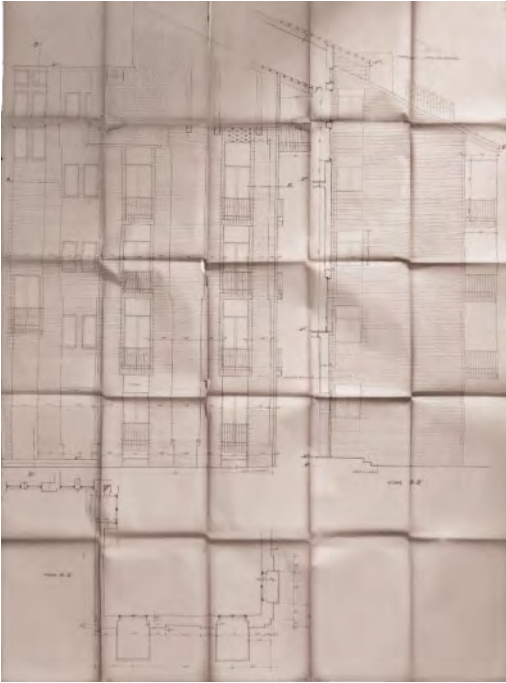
Detail drawing with the elevation of an H-shaped building with the system of tapered pilasters (1:10) (ATC, 14563).
